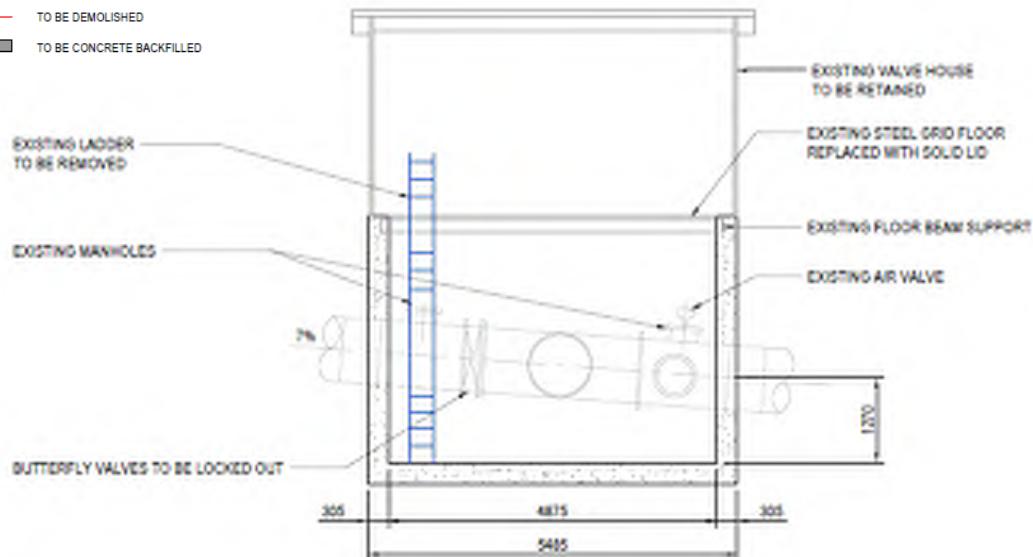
Typical cross section of High Level Outlet Pipes – Option 1D
